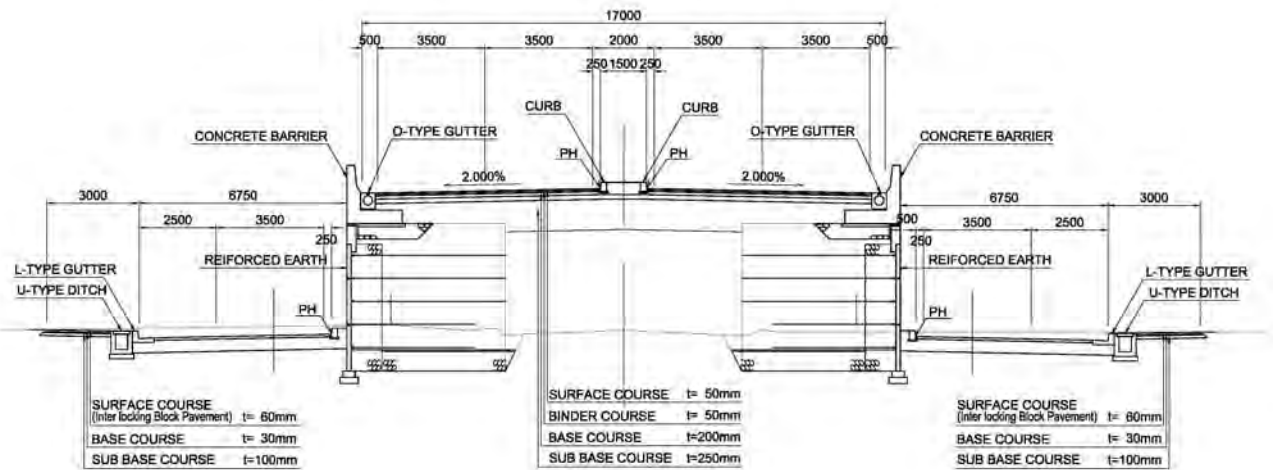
(5) Typical Cross Section of Approach Road in Narny Road
